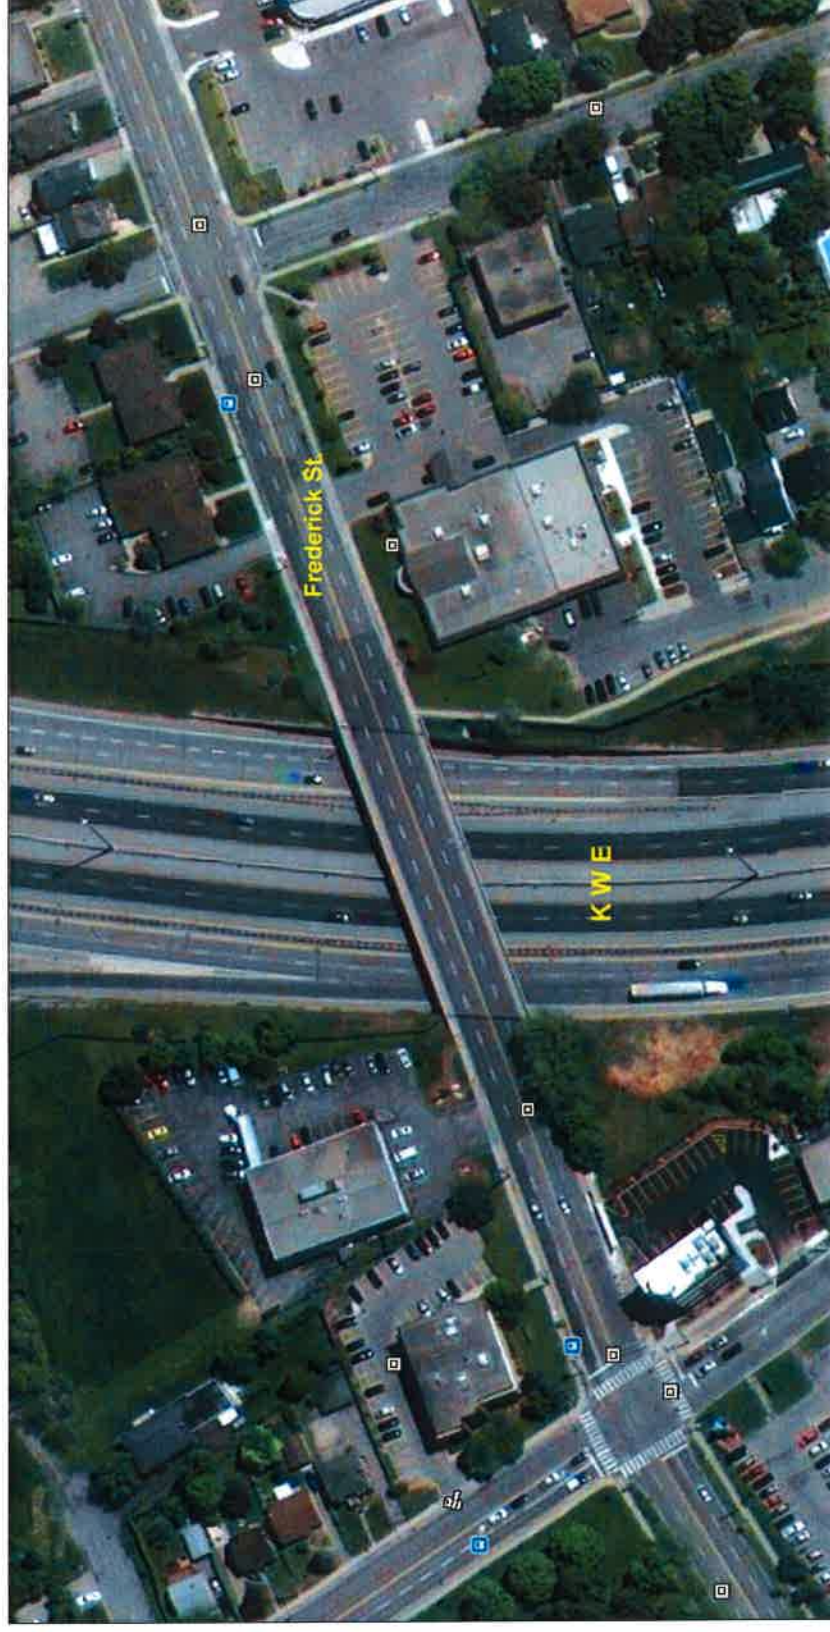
Aerial view of Kitchener-Waterloo Expressway and Frederick Street
